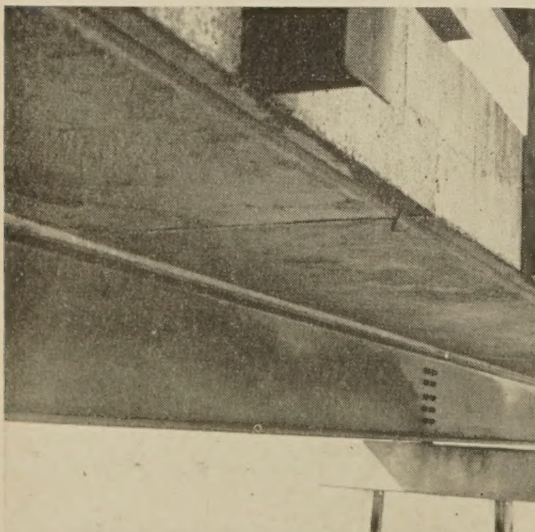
Severe erosion of paint on steel and even pitting of the concrete on north side of east end of Mile 27 Bridge.
